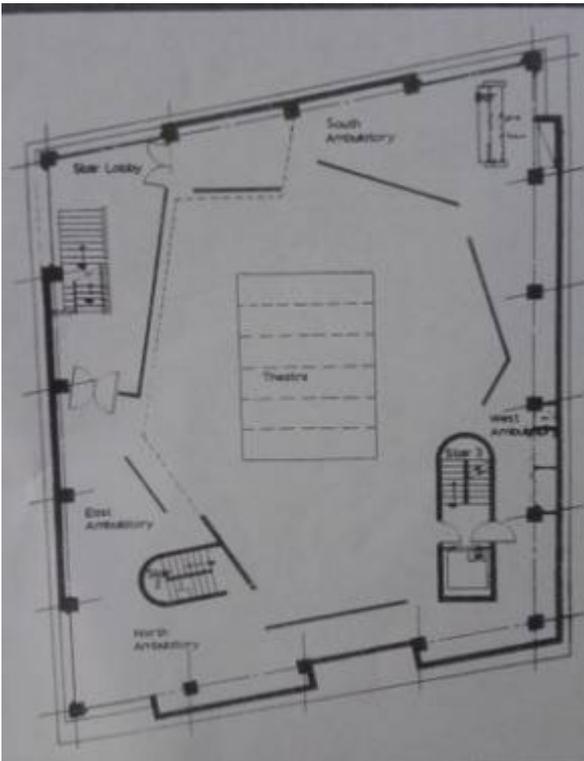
Auditorium floor plan of the Hannah Playhouse (*Designscape*, Nov 1973, p. 6)
